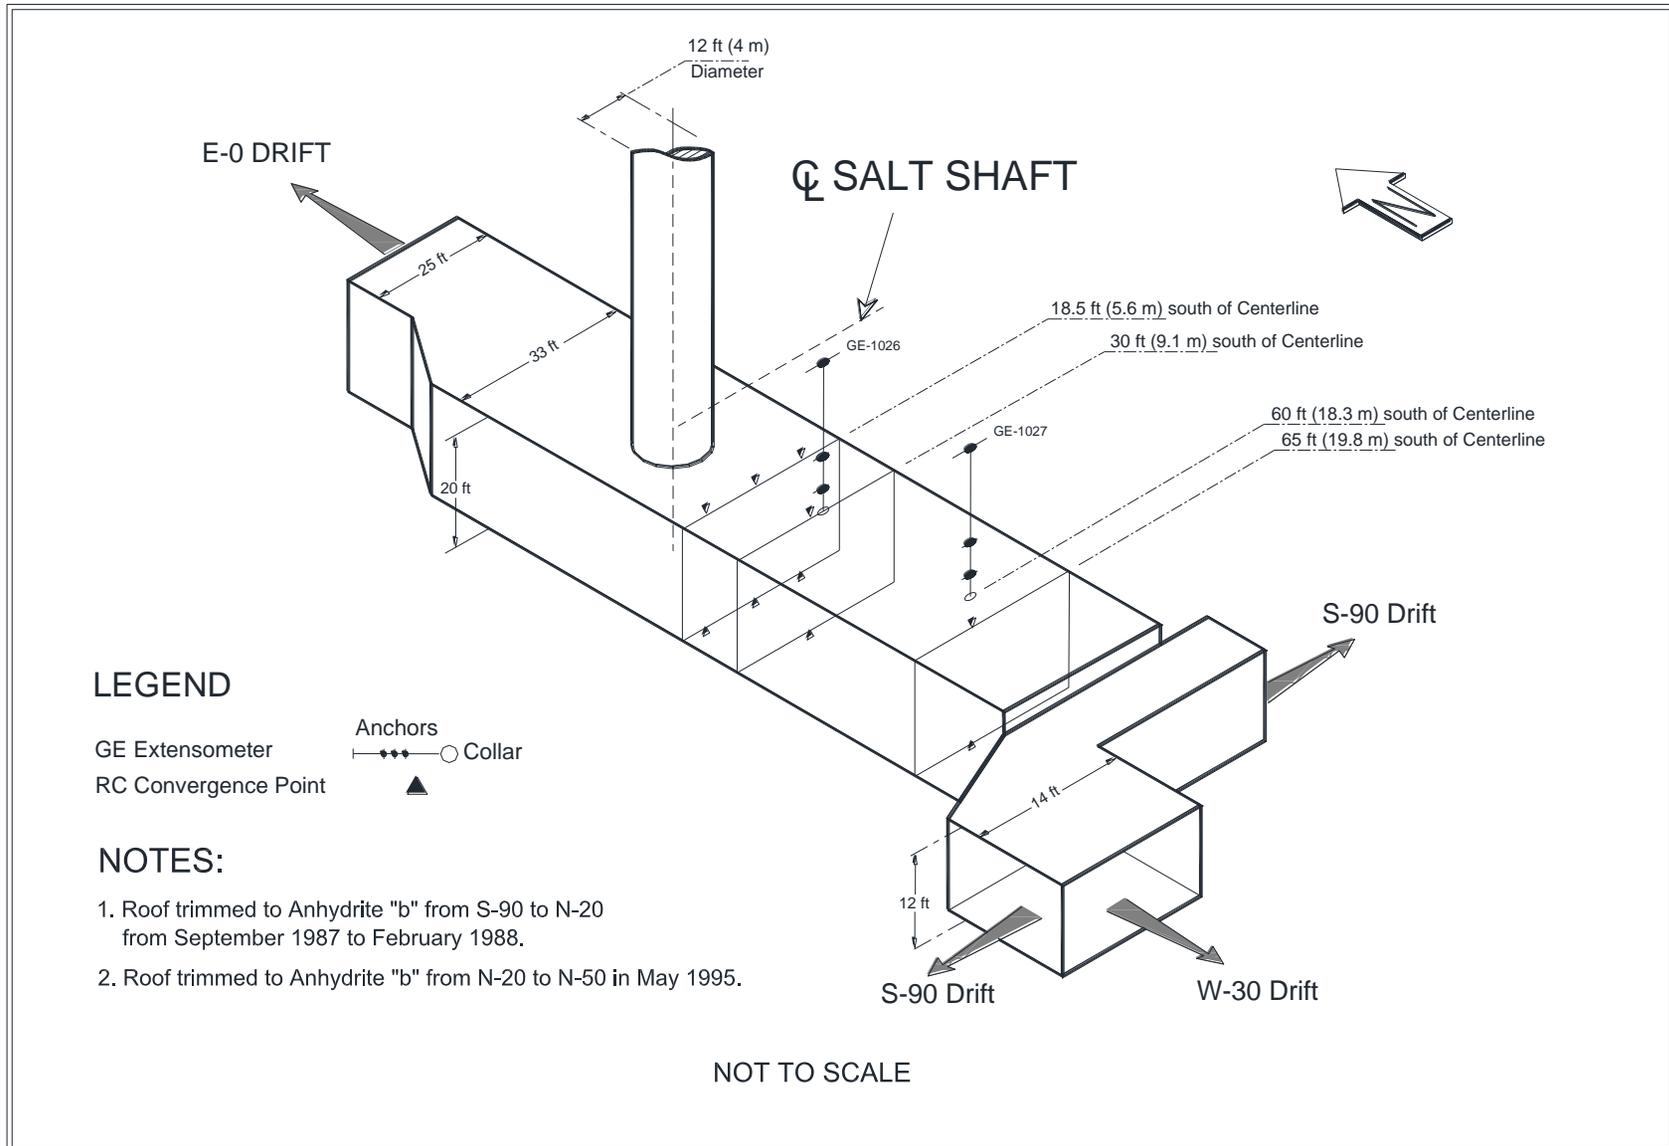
Salt Shaft Station Instrumentation after Roof Beam Excavation
